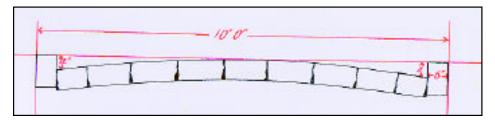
Engineering Drawing, construction of Right of Way at rear of Kangerong Road, Box Hill, 1923, Shire of Nunawading, "City of Whitehorse".
